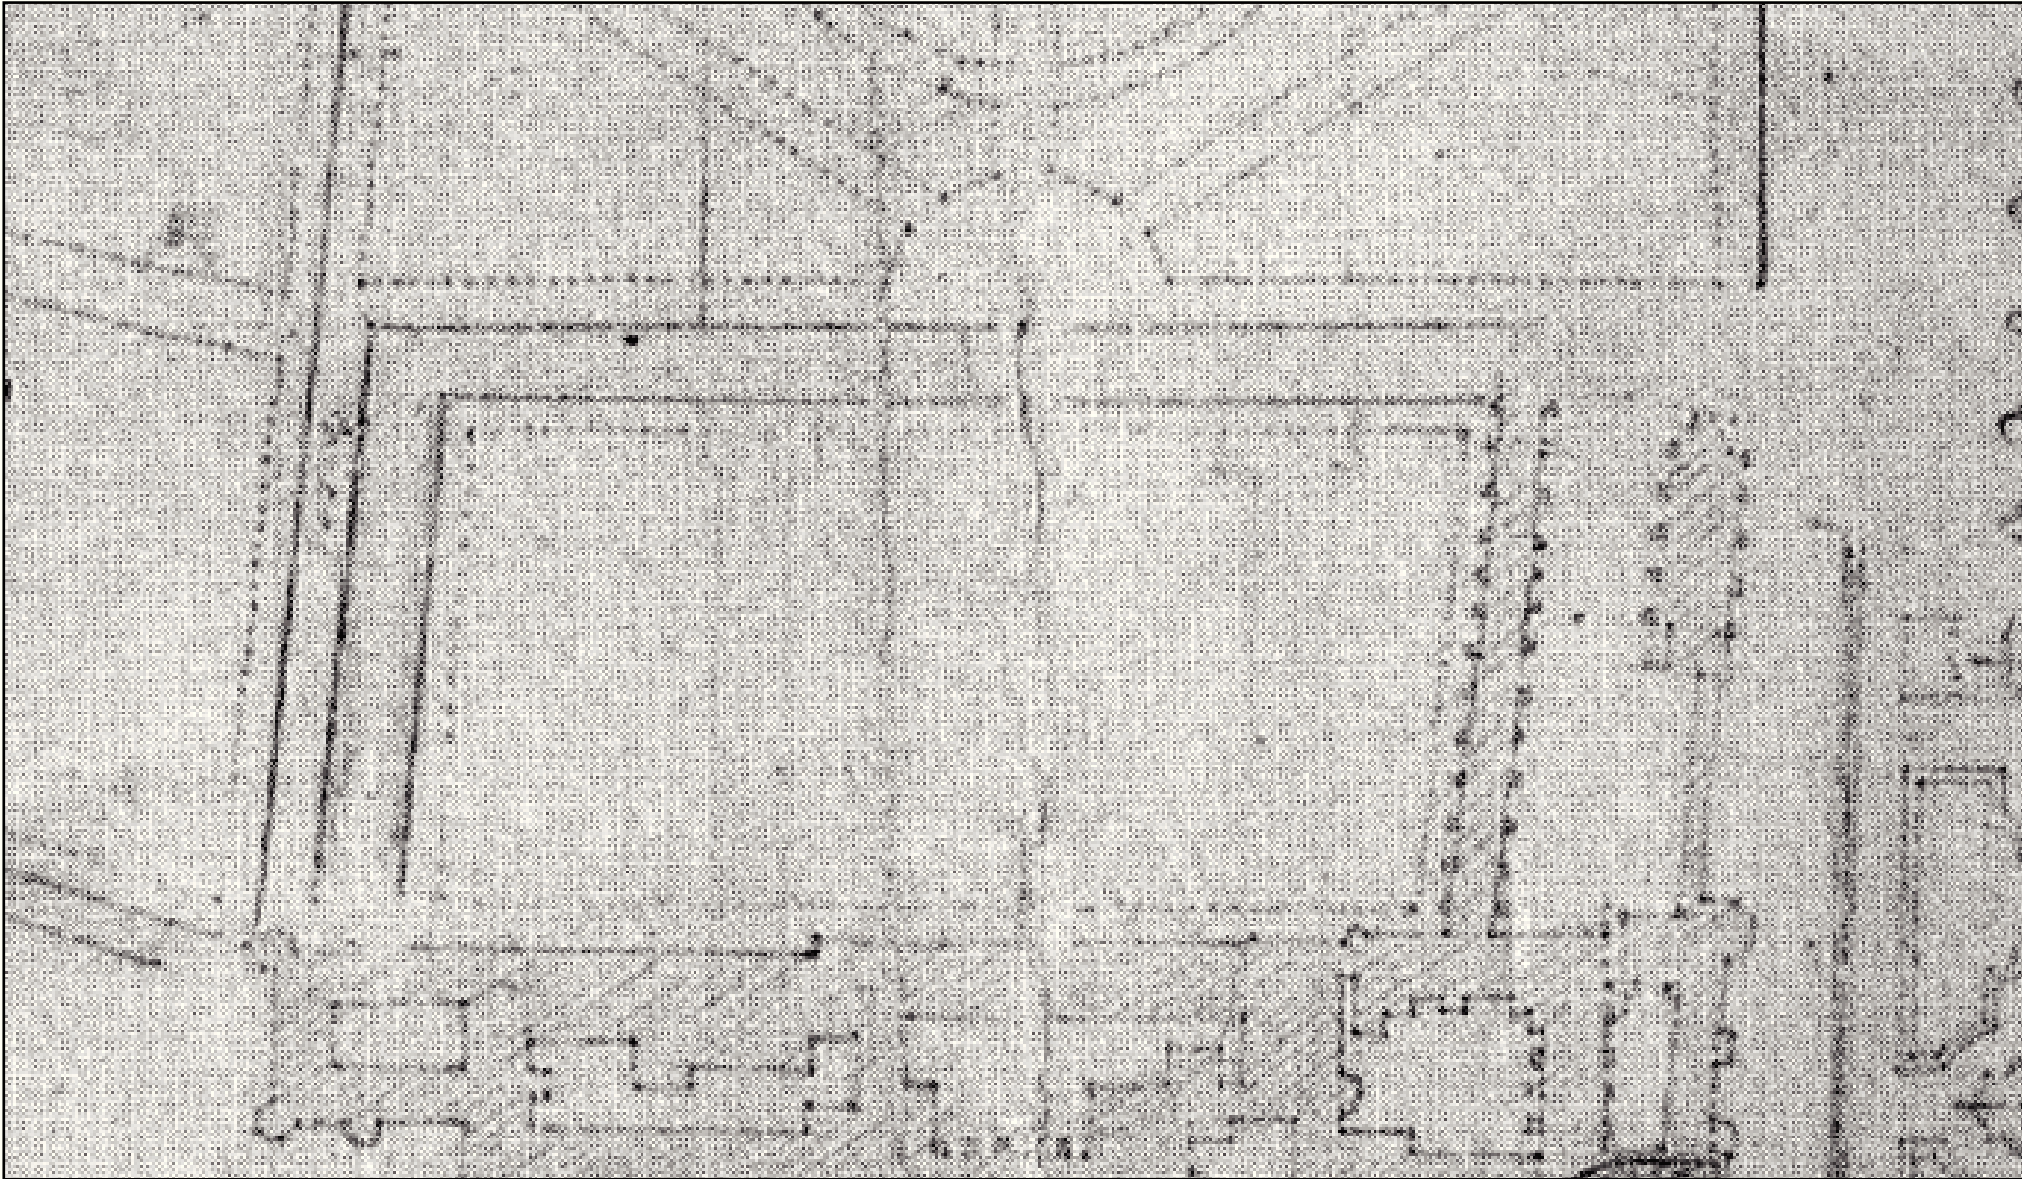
Extract from plan by Hawksmoor (c. 1689)
